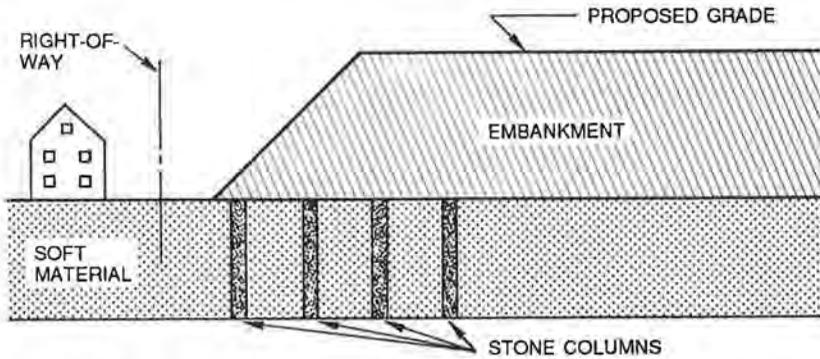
Stone columns used to stabilize highway embankment (courtesy New York State Department of Transportation).
